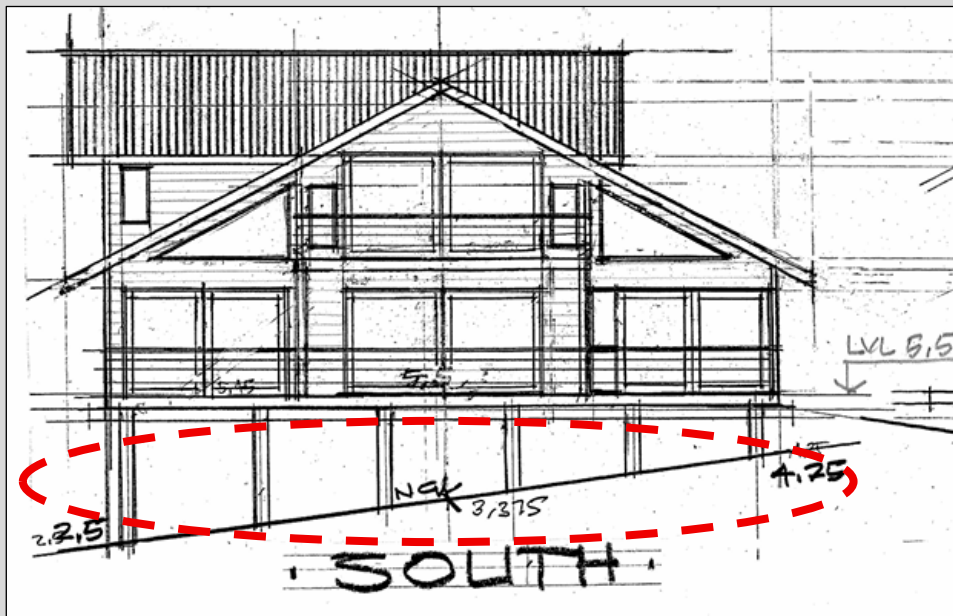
South-section of the proposed dwelling designed to be completely elevated from natural ground level to ensure that the structure is above the 1:100 year flood line.
